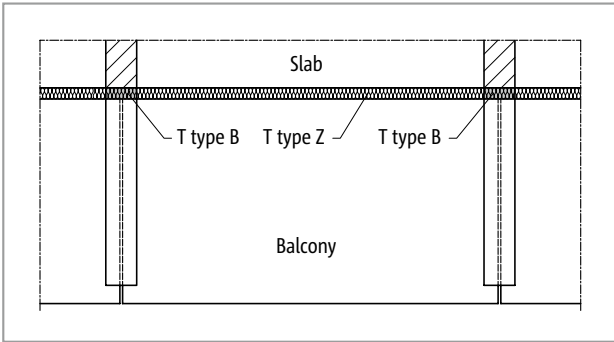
Schöck Isokorb® T type B: Balcony structure with freely cantilevered downstand beams (precast balcony)
